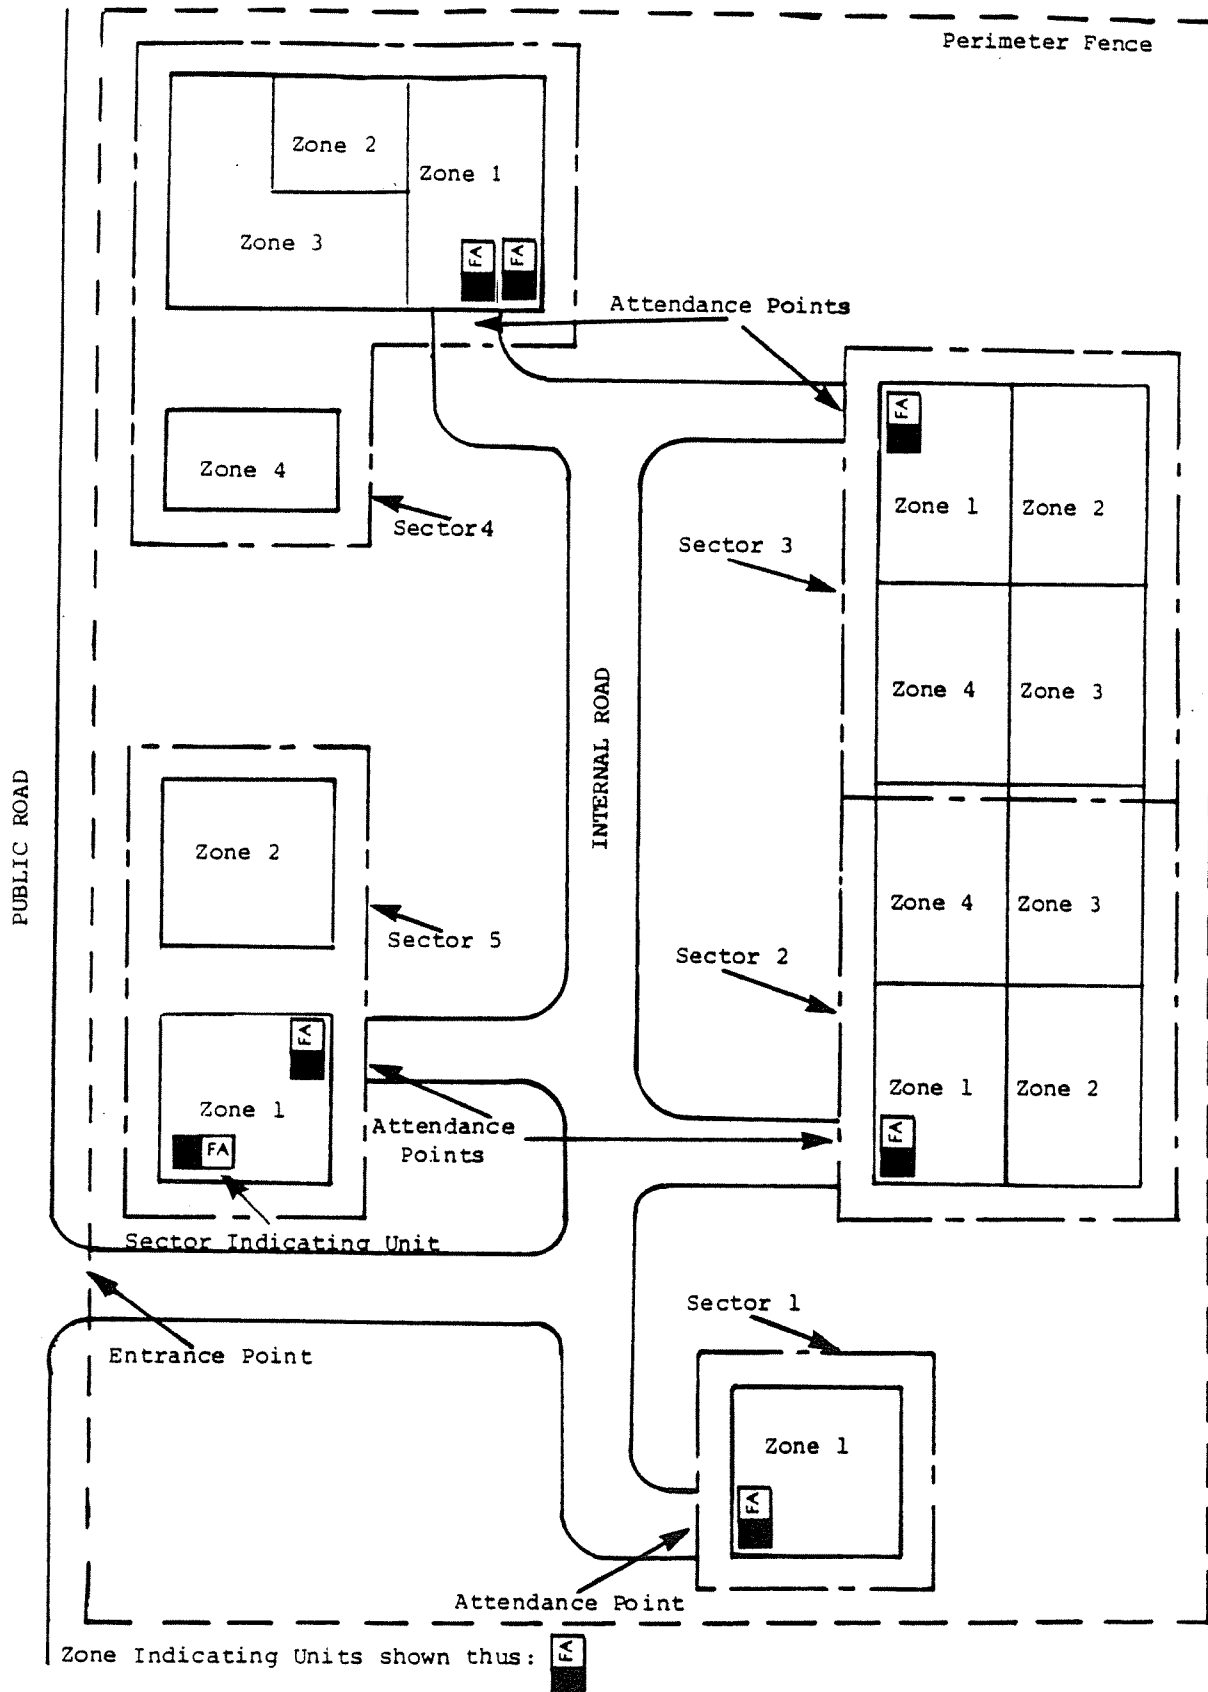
EXAMPLE LAYOUT OF ZONES AND SECTORS
